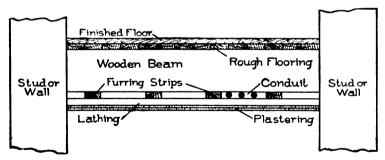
Running Conductors Concealed under Floor in Wooden Frame Building.
